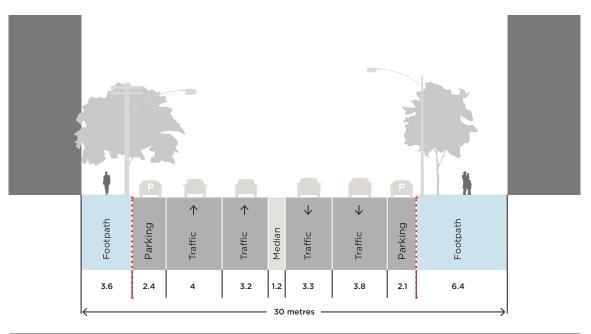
Existing conditions of City Road between Queens Bridge Street and Balston Street, looking east towards Power Street (Section B)
